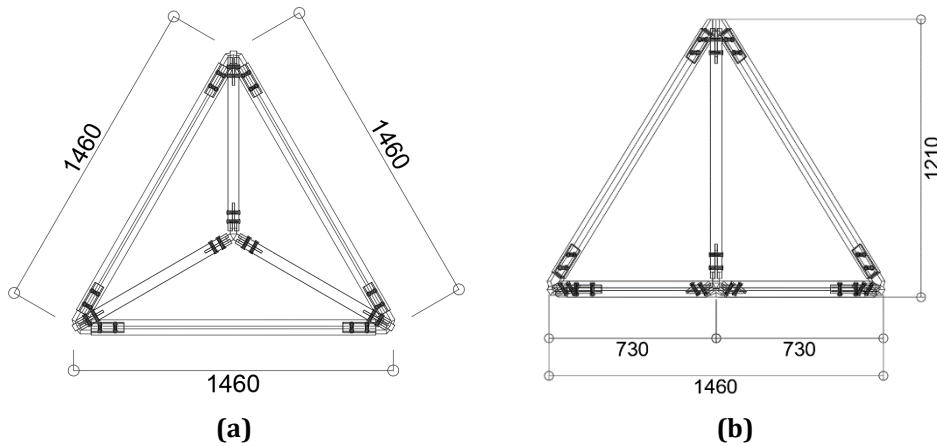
Configuration of Glubam truss member's cross-section (dimensions in mm)
